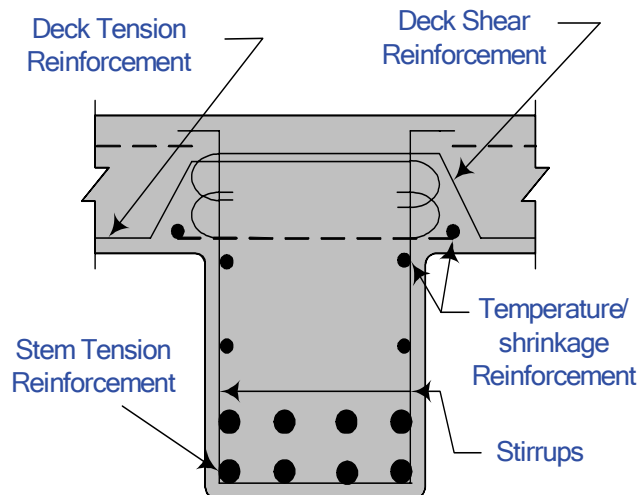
Steel Reinforcement in a Concrete Tee Beam
